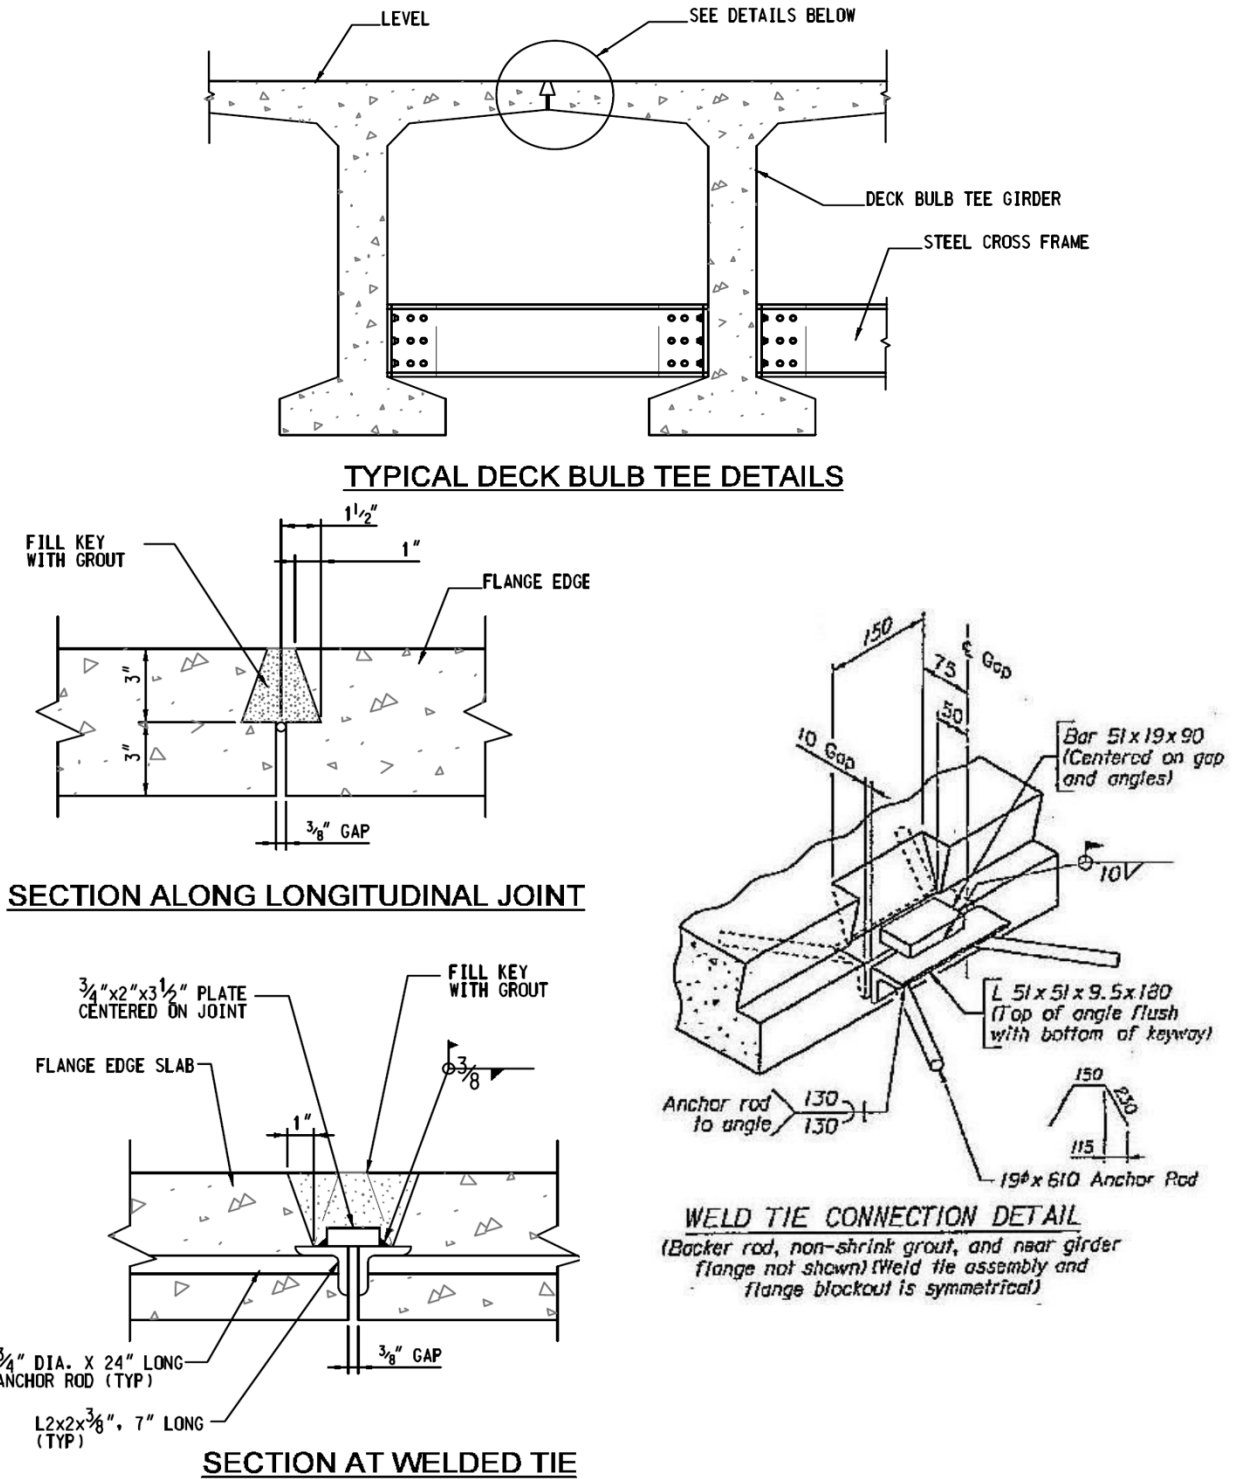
Welded tie connection detail for bulb tee beams used by the Wyoming DOT over Fork Crazy Woman Creek, spaced approximately every 6 ft.
